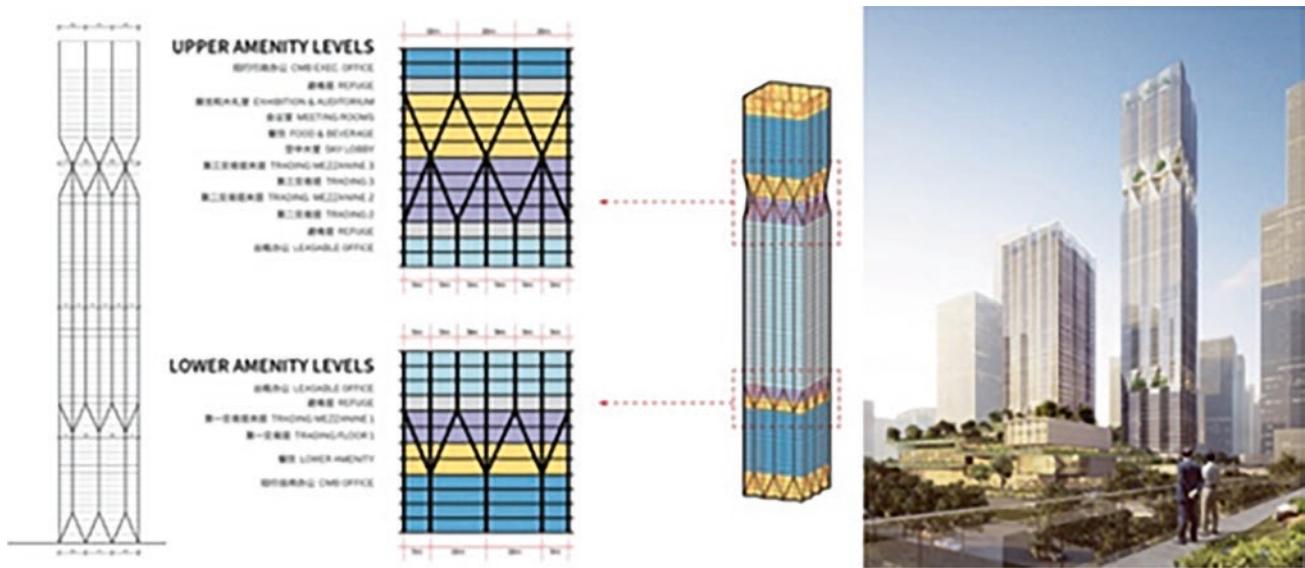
Concrete frame elevation, program description, final rendering of China Merchant Tower
